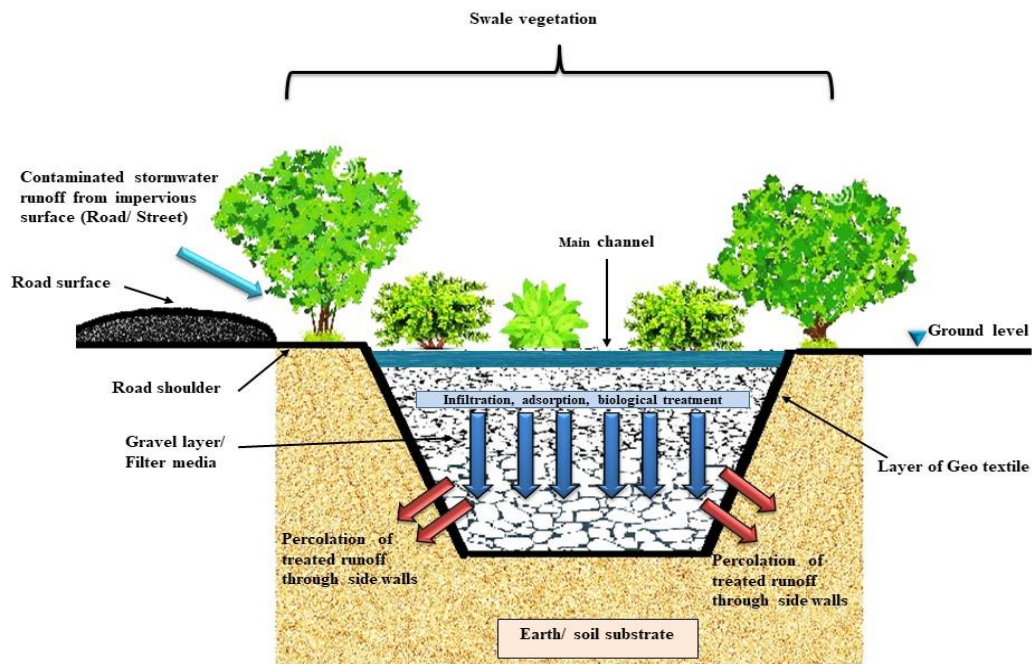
Cross sectional view of a typical bioswale used to treat stormwater runoff originating from road/ highways
